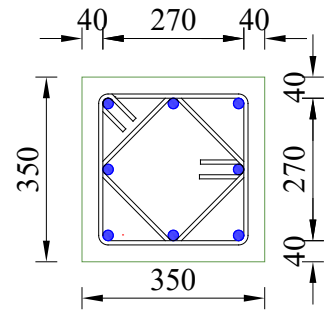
TYPICAL COLUMN DETAIL FOR THREE STOREY BUILDING
